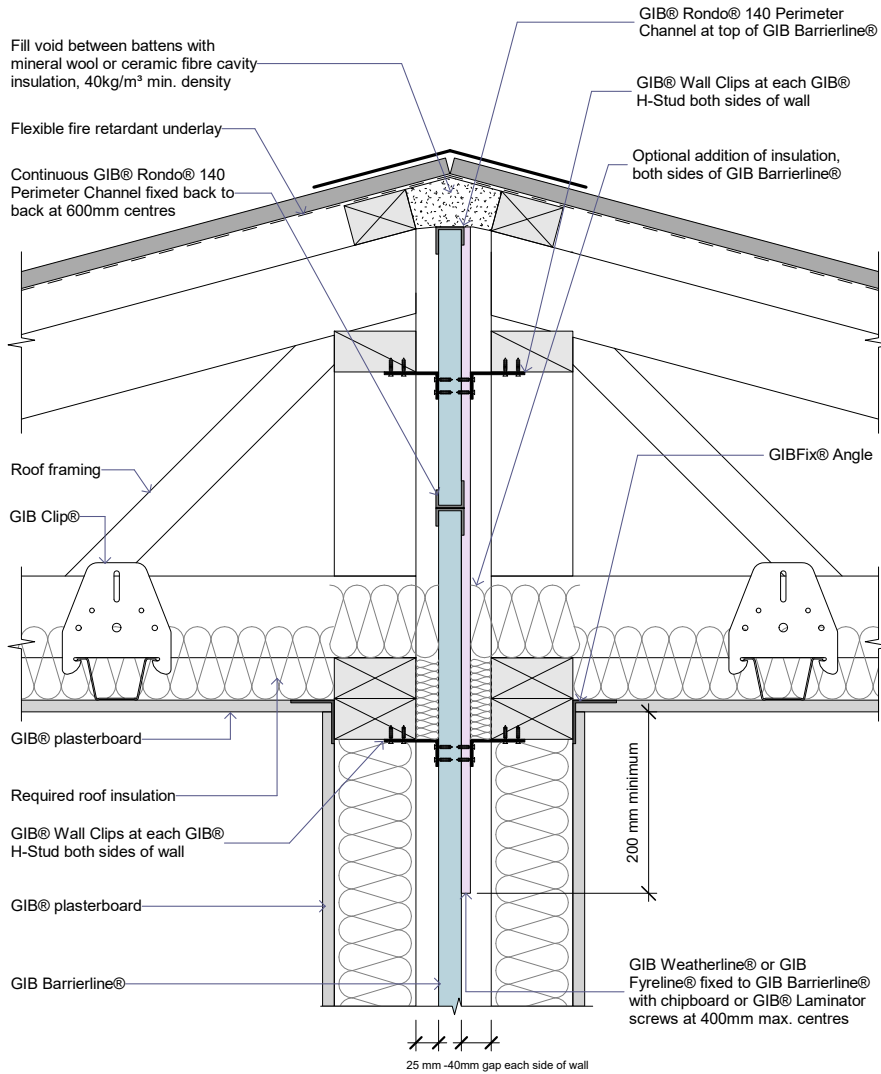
DETAIL AT ROOF/CEILING AND PARAPET (END ELEVATION)
